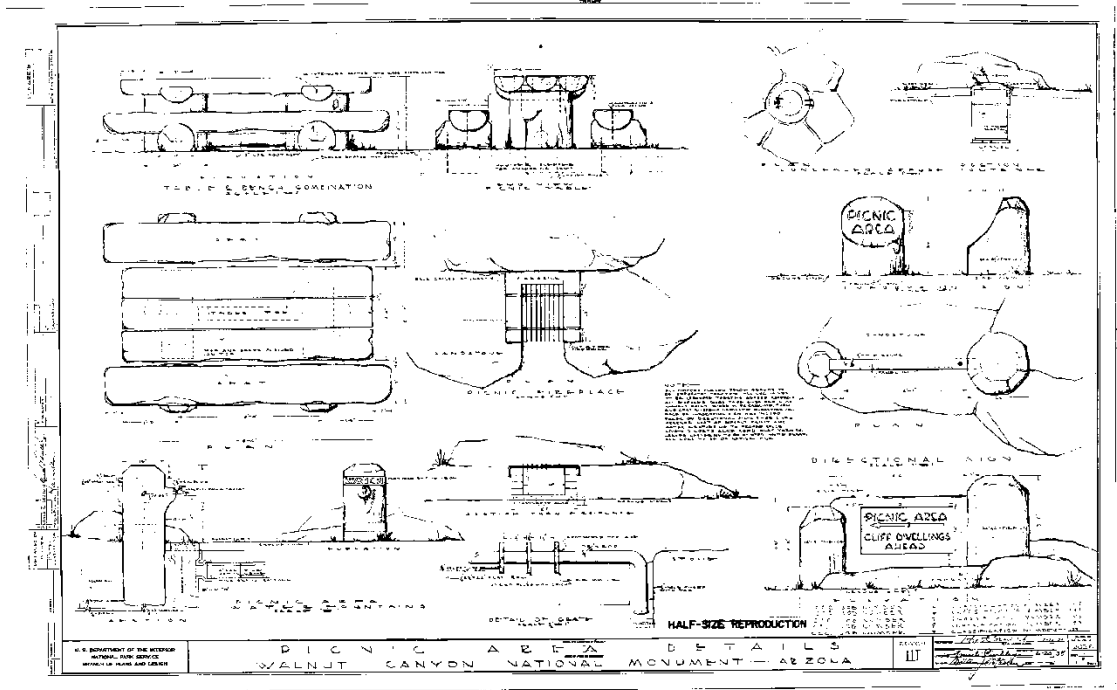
1938 drawings showing preliminary plans for the installation of water fountains at the picnic area.
